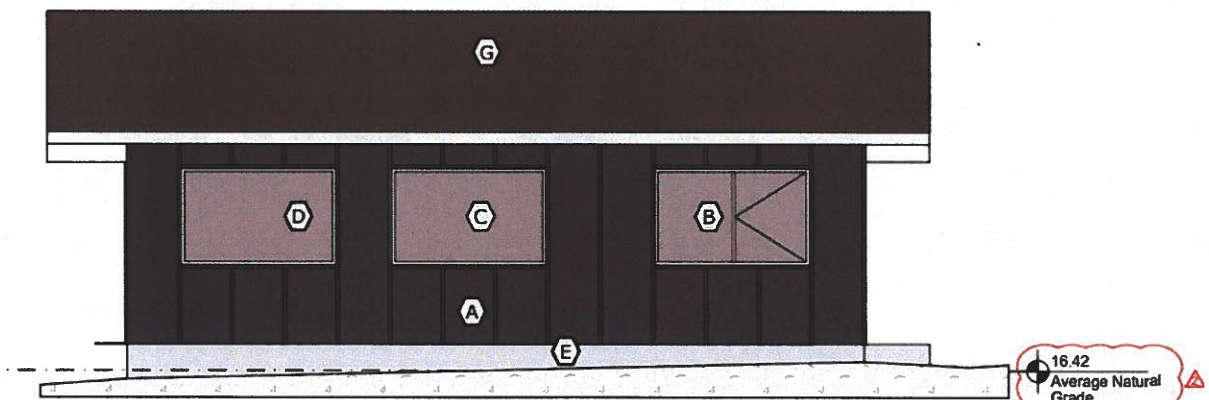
South Elevation (from plans by House Behind the Hedge Design Build)
